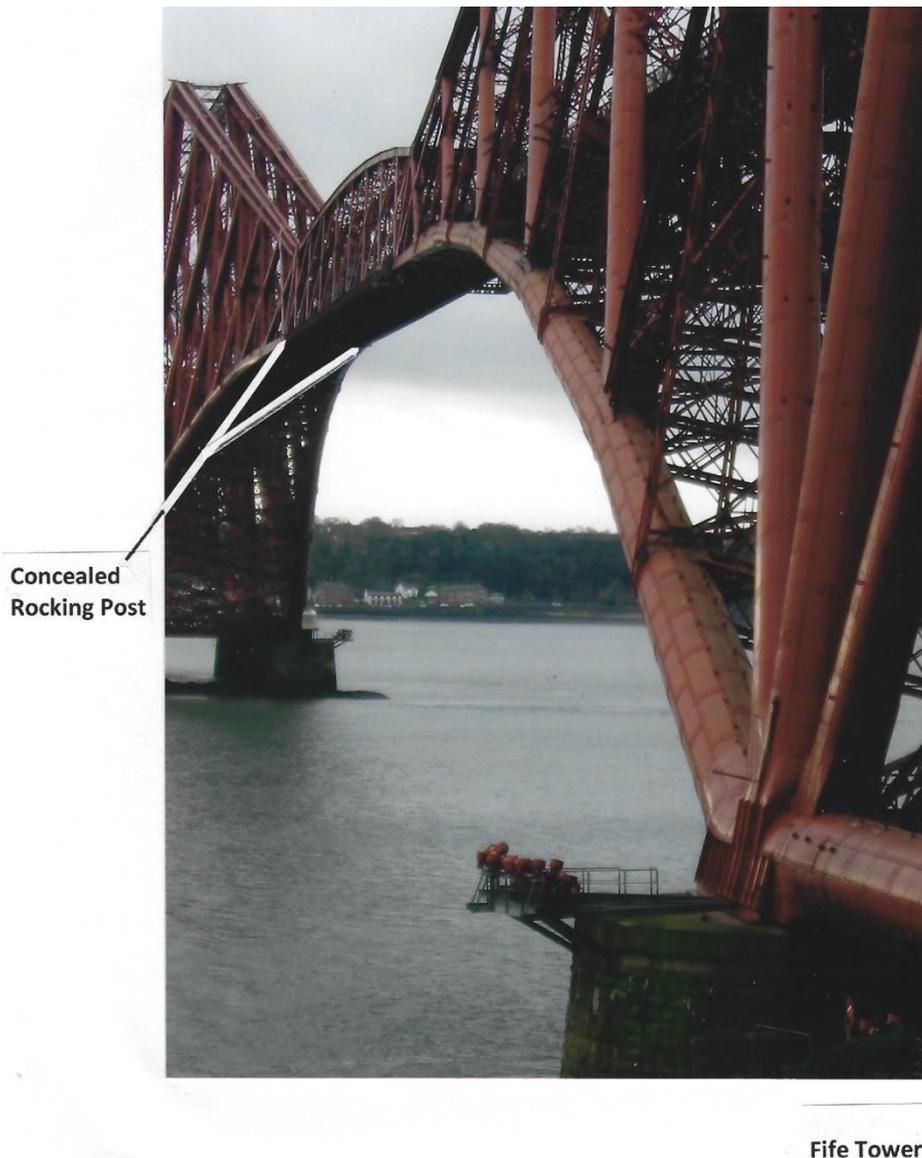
The Central Girder between Inch Garvie and Fife Cantilevers, looking towards South Queensferry.
